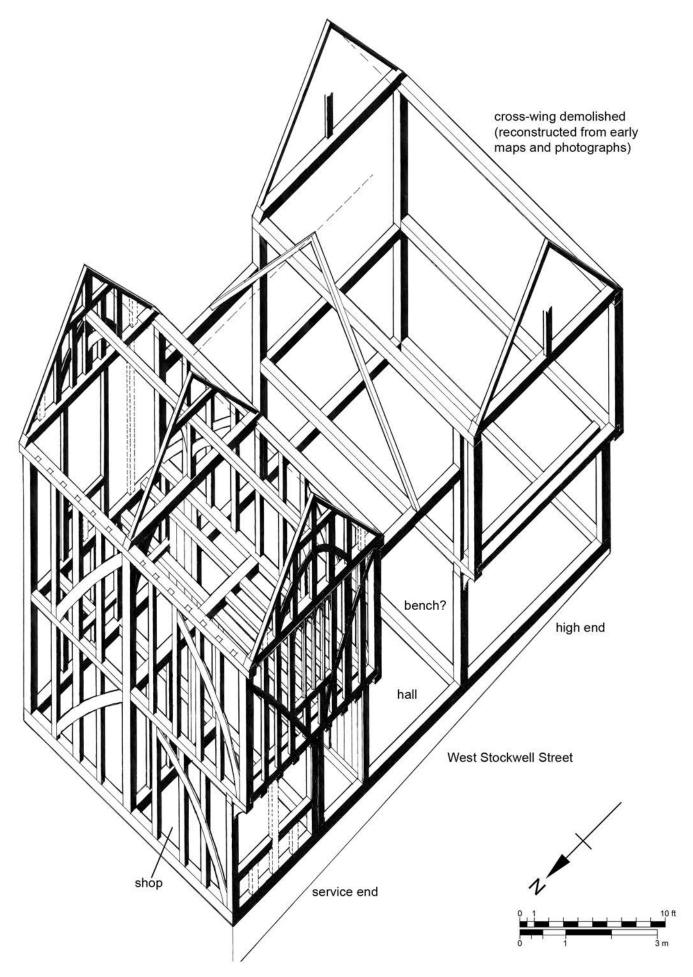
Isometric view of the second house (Part B) to the south with shop and reconstructed south cross-wing, 18 West Stockwell Street (corpus no. 101)
